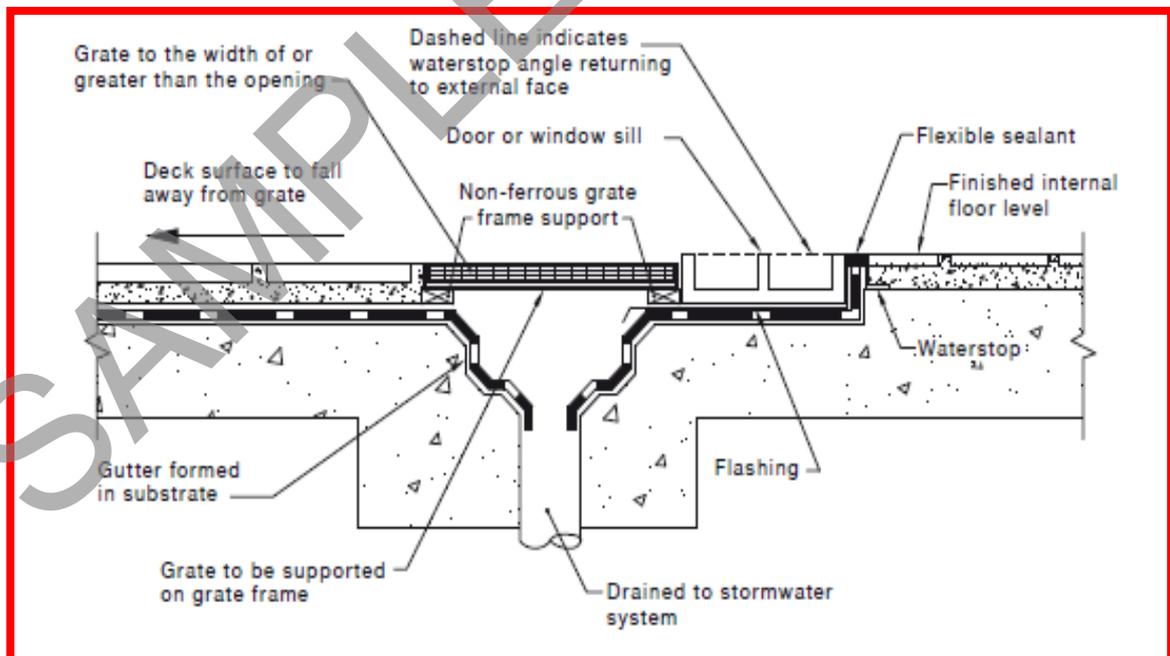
Figure 2.9 Typical Details Of Membrane Termination At Wall Openings Where The Internal And External Finished Floor Levels Do Not Allow For An Upturn.
